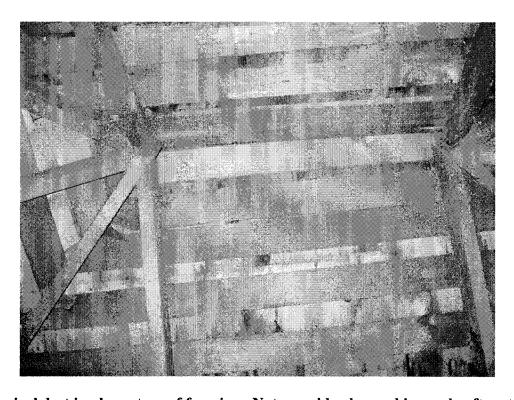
Typical, but inadequate roof framing. Note no ridge beam, hips and rafters toe nailed.
